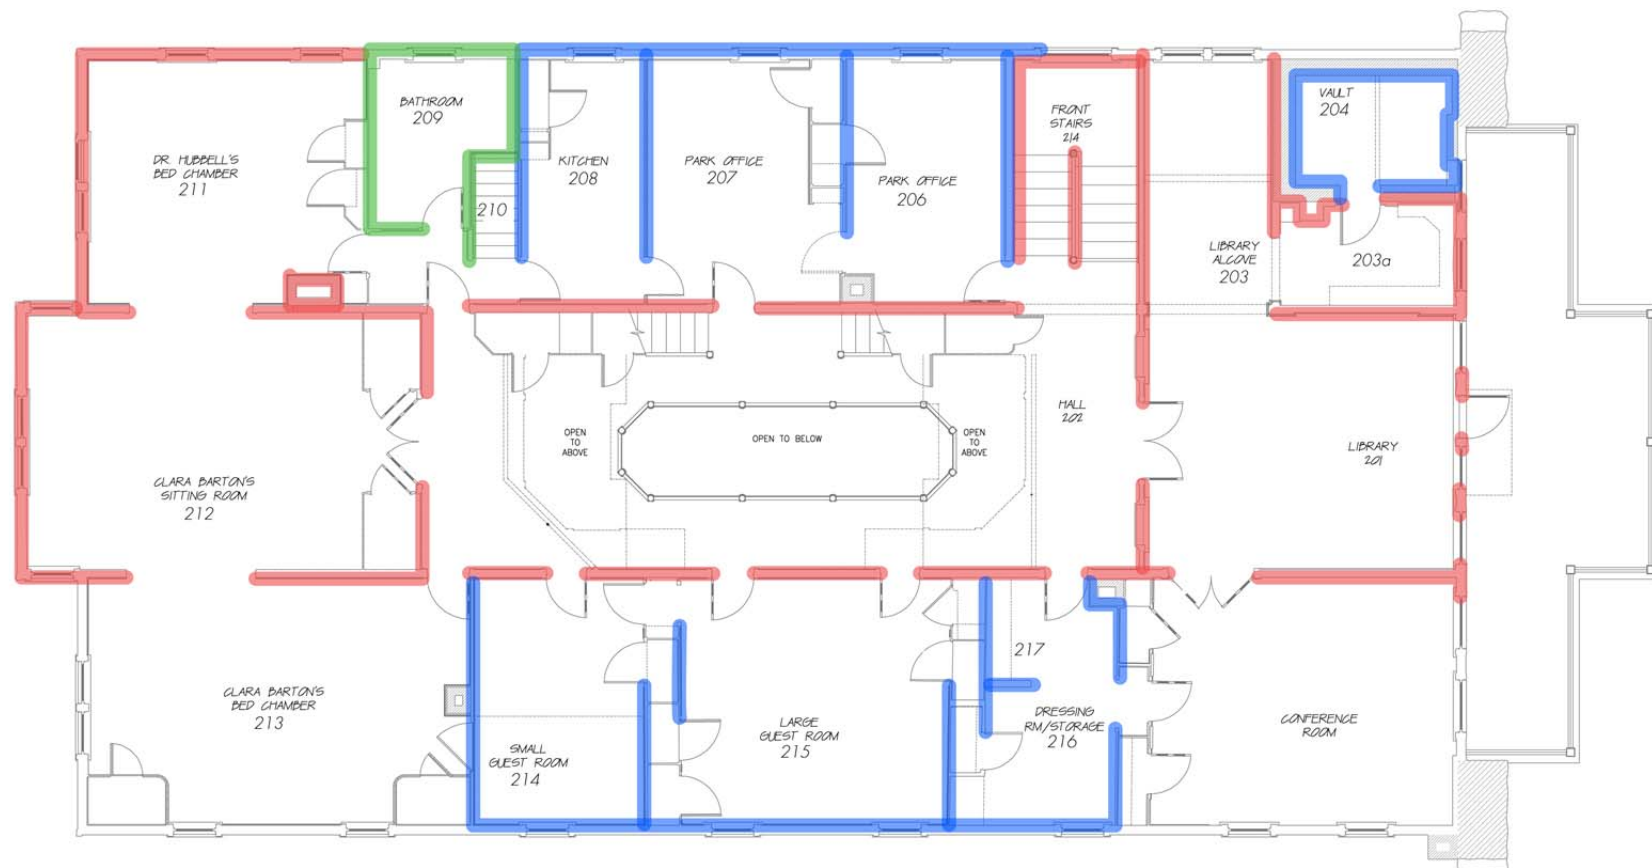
INTERIOR ZONES OF SIGNIFICANCE (FIRST FLOOR PLAN)
